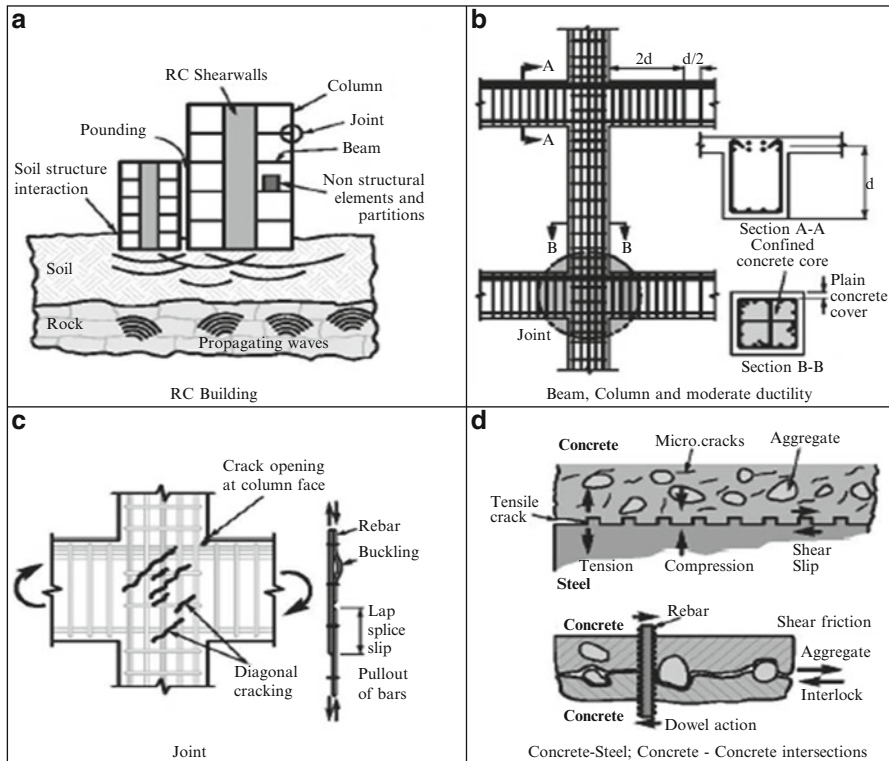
Different scales in constructing the models for various damage mechanisms for reinforced concrete structures, from complex system scale (structure with its environment), over structural scale (illustrated for reinforced concrete frame structures) to material scale for concrete
